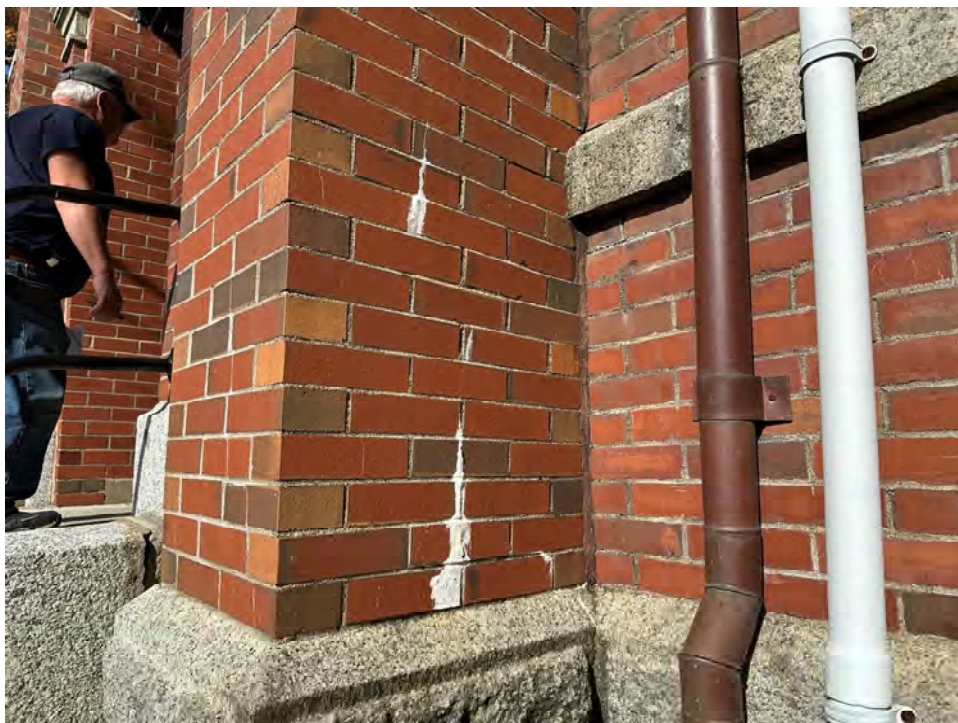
Efflorescence on pilaster adjacent to south elevation Cumberland Street entrance
